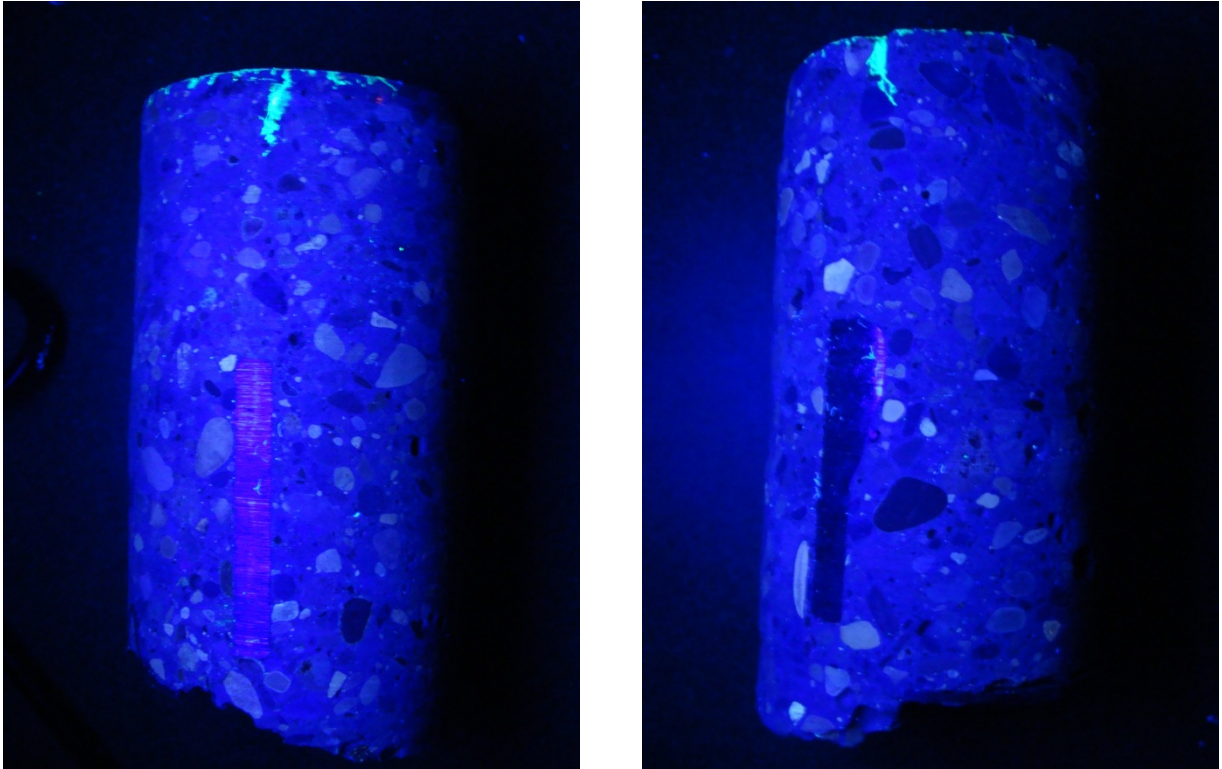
Core SLS2 (left) west elevation; (right) east elevation
